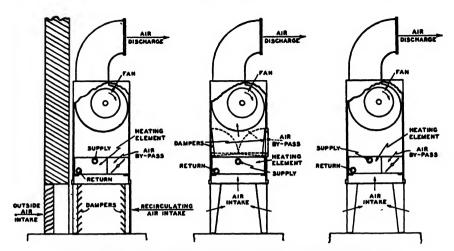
CENTRIFUGAL FAN TYPE UNIT HEATER-FLOOR MOUNTED
